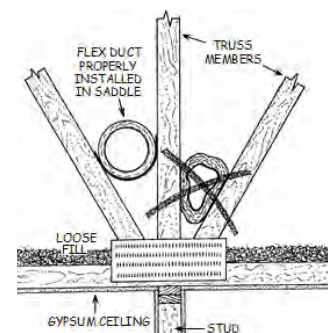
SUPPORT OF FLEXIBLE DUCTS
